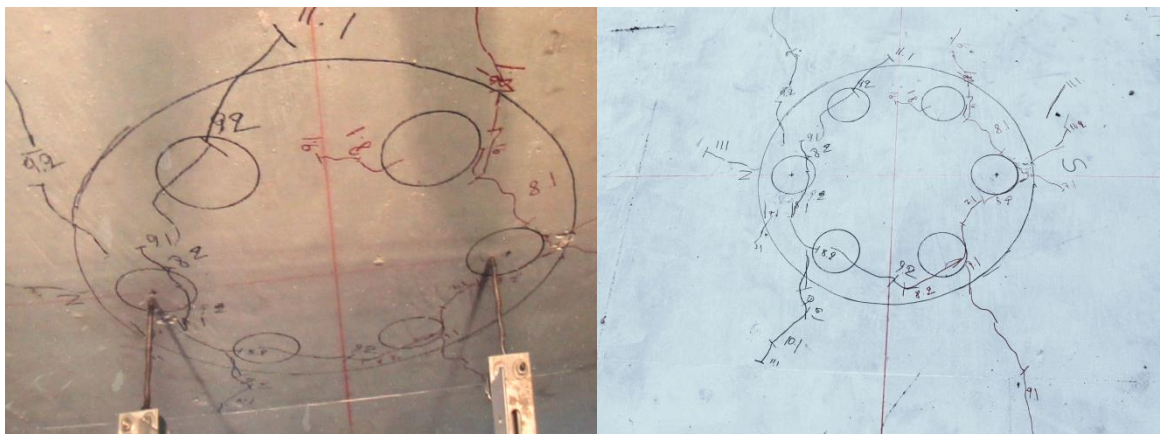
Damage at the slab-column interface after the testing of Specimen #3
